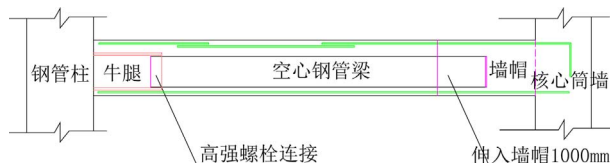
The connection diagram of hollow steel beam and steel tube column, core tube wall cap
